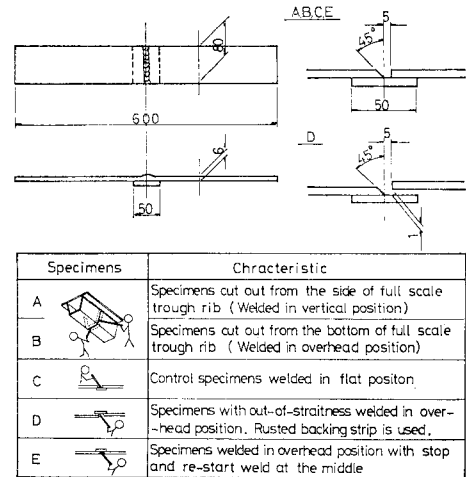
Tensile fatigue specimens simulating a part of field-welded trough rib joint.
